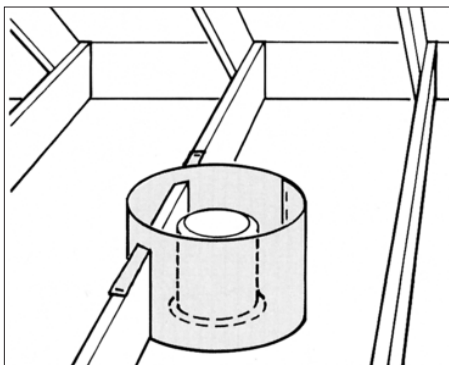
If a fixture is next to a ceiling joist, notch the baffle around the joist.
